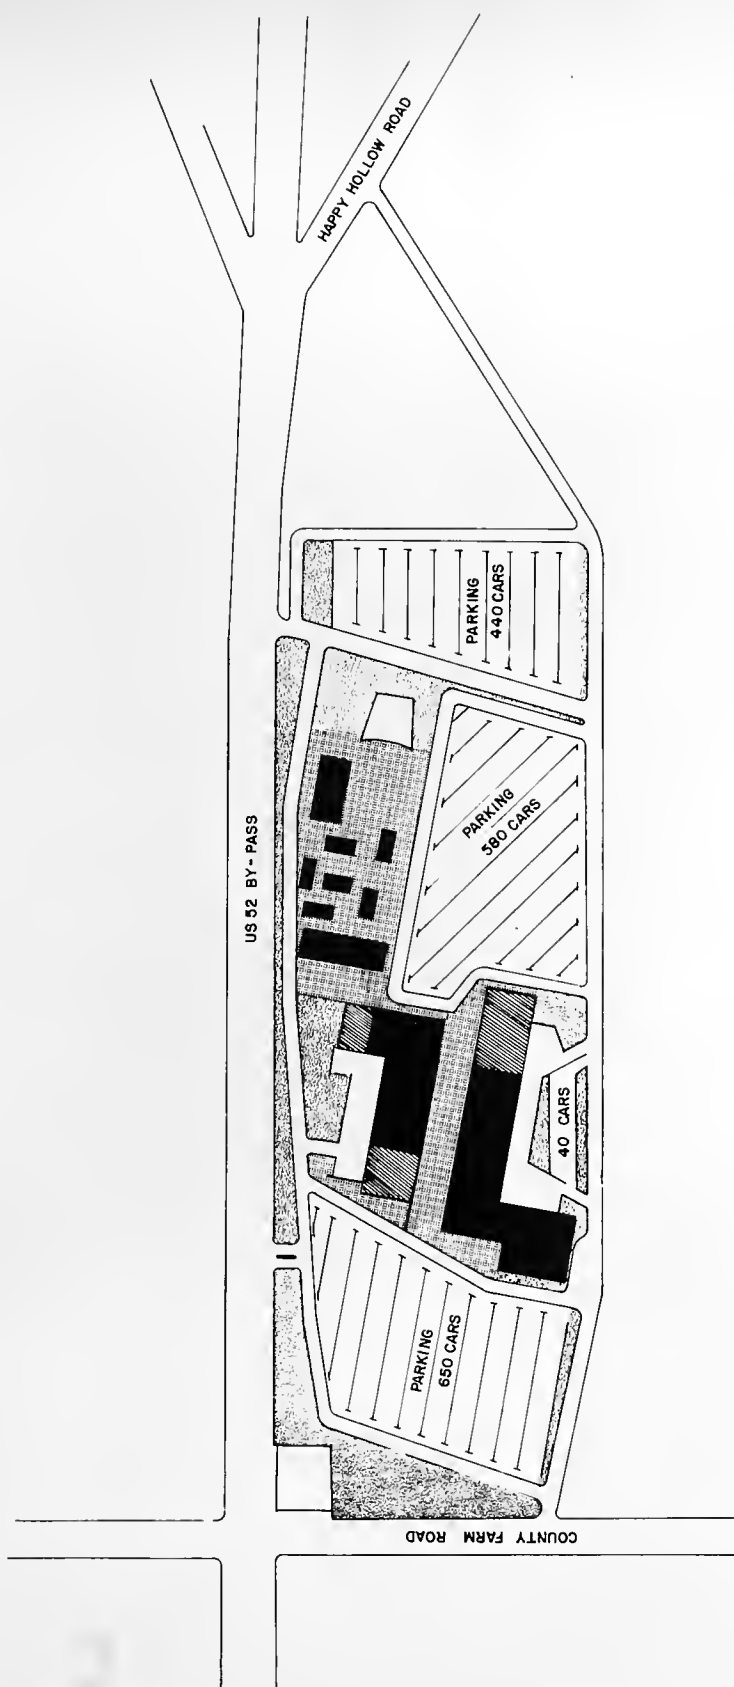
SITE PLAN FOR THE WABASH VILLAGE SHOPPING CENTER
